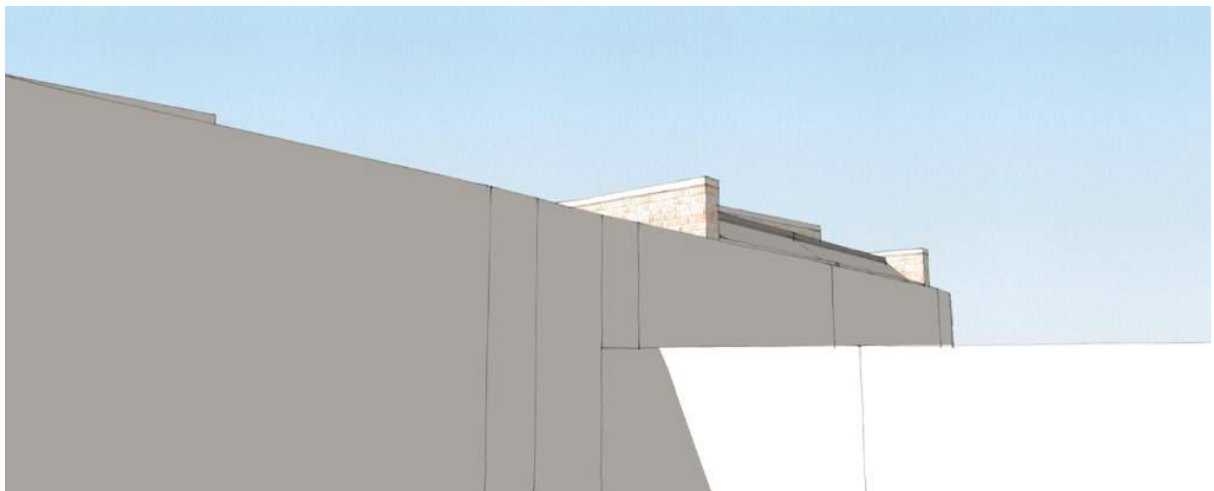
Proposed illustrative view from rear of Lambton Road (Taken from Design & Access Statement prepared by Create Design + Architecture).
